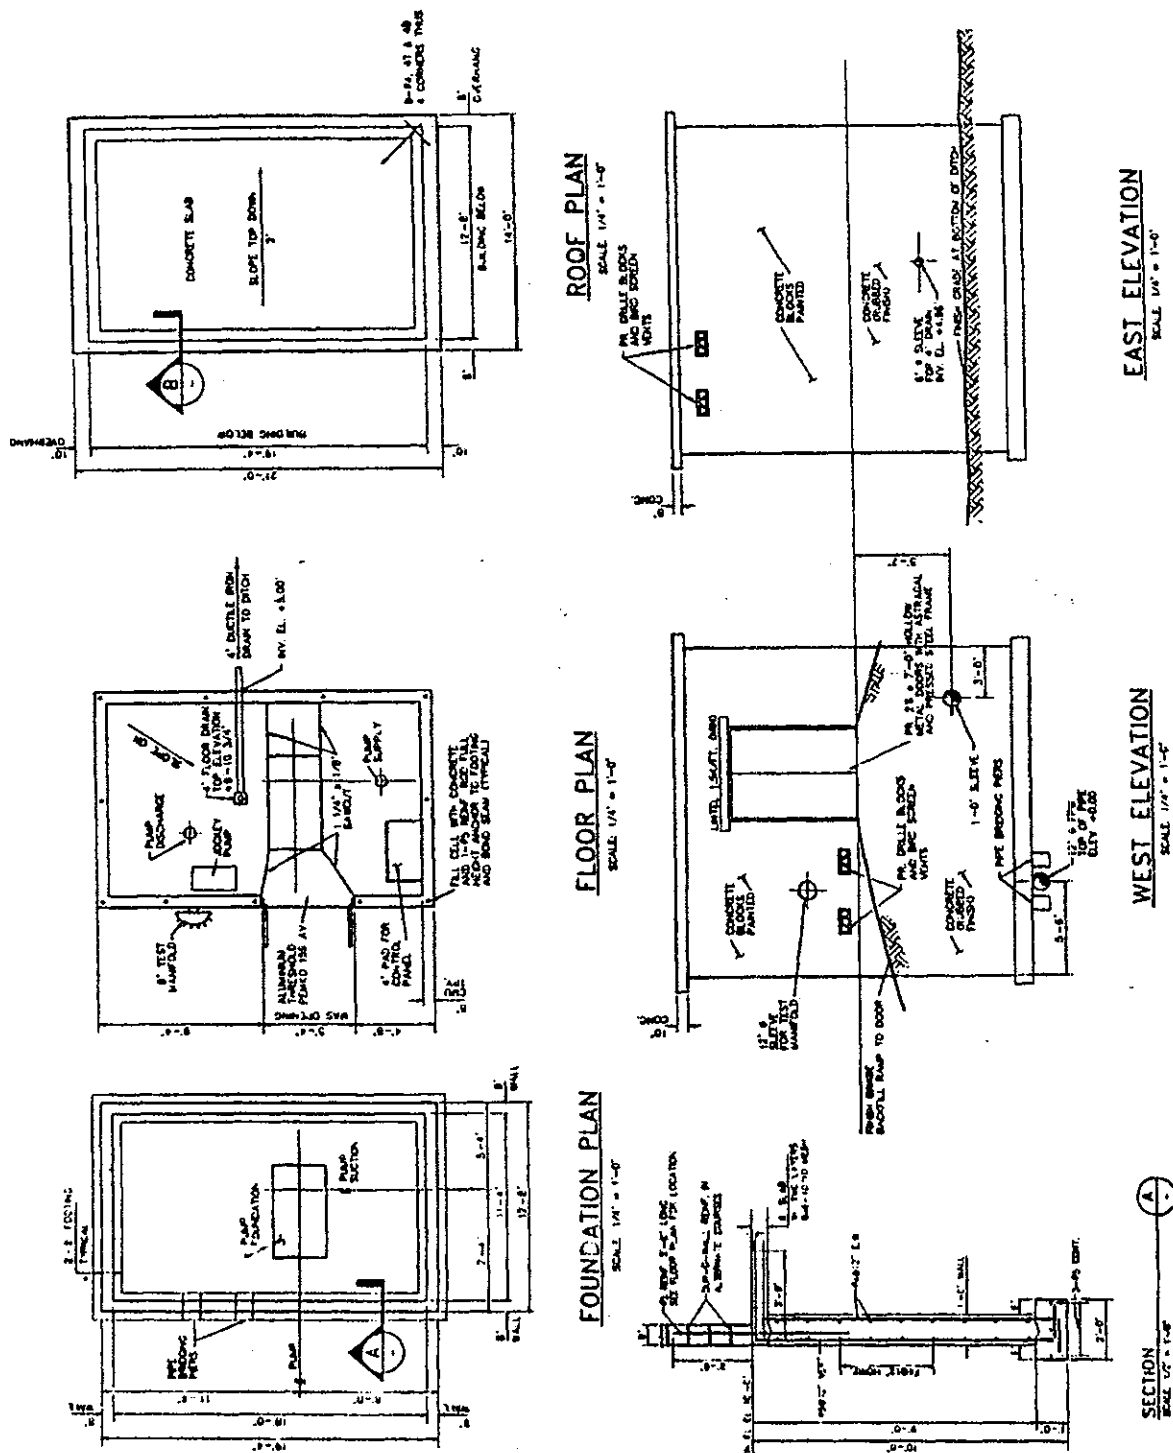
Structural Concrete Plan, Elevation, and Section
